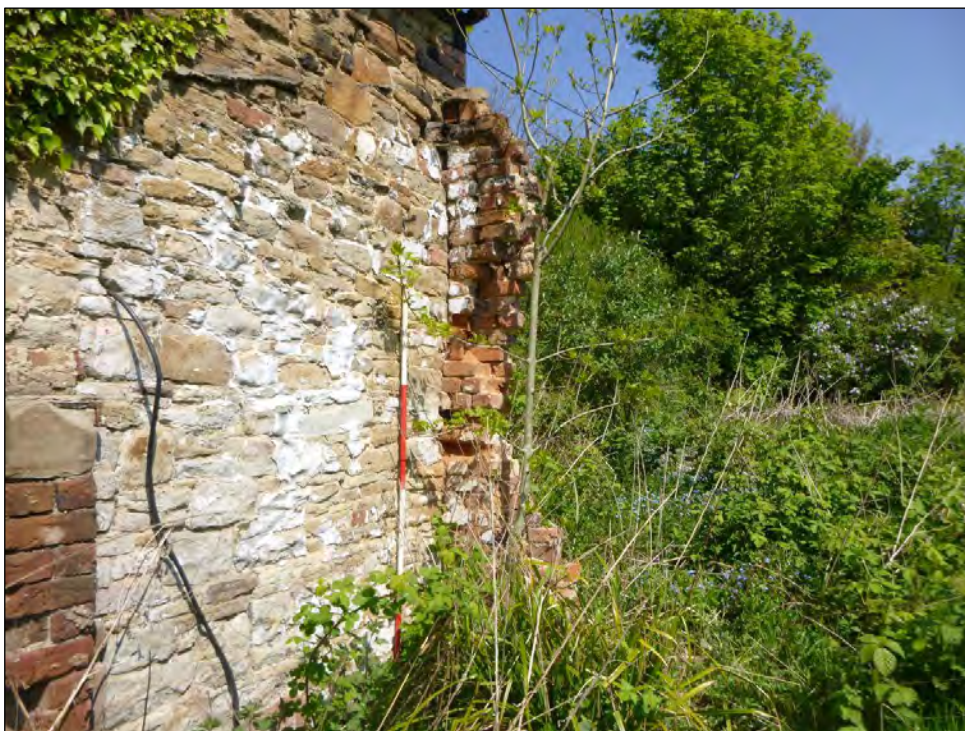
Brick wall extension of outbuilding protruding from eastern elevation, scale 2m
